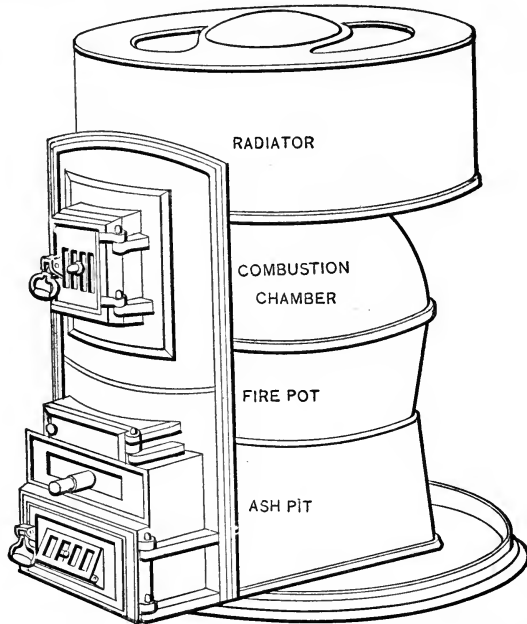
Cast-iron Furnace (Less Casing) with Steel Radiator.
